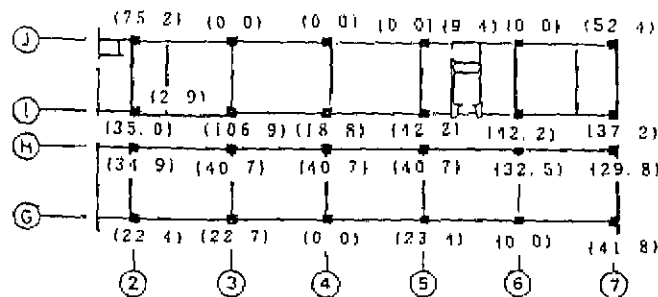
REMAINING LATERAL STRENGTH OF COLUMNS OR WALLS
